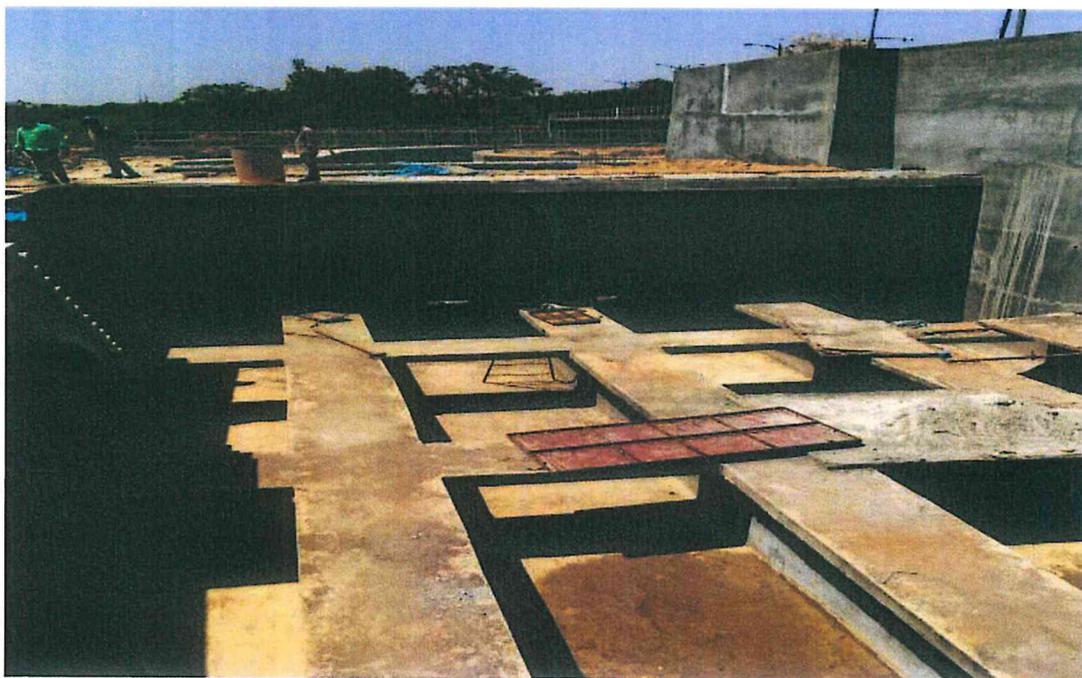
Construction of new I&D Structure of capacity 150 MLD in Necklace Road adjacent to I&D Structure of 100 MLD capacity
